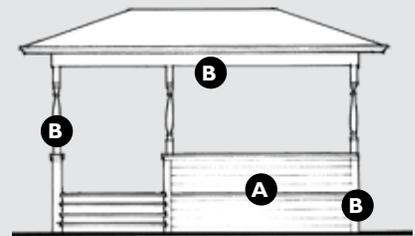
Apply a color to the front porch plane of the façade; if a solid porch wall is provided instead of balusters, this color should match the base color. For trim, columns, balusters and edge boards the trim color is typically the same color as the trim on the main building plane (B).
